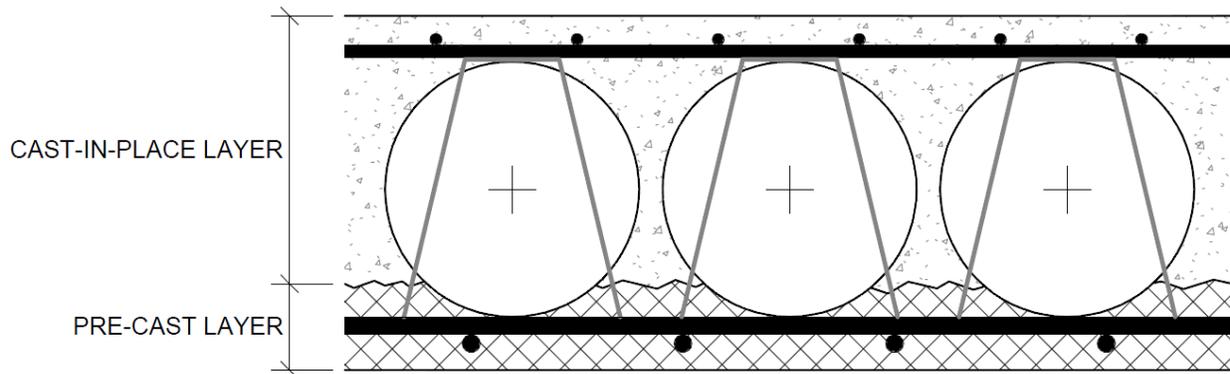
Cobiax Semi Pre-Cast Voided Slab Section
